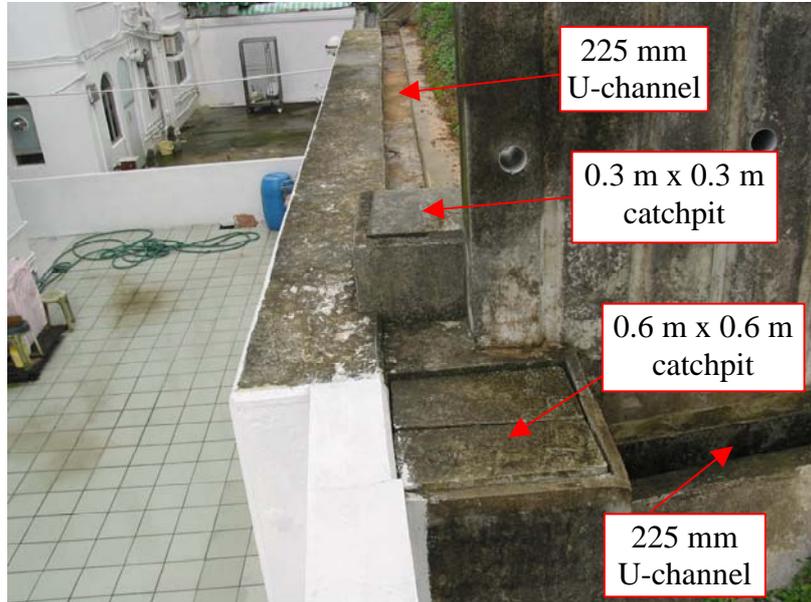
View of the Catchpits at the East Corner of No. 56 Denon Terrace
